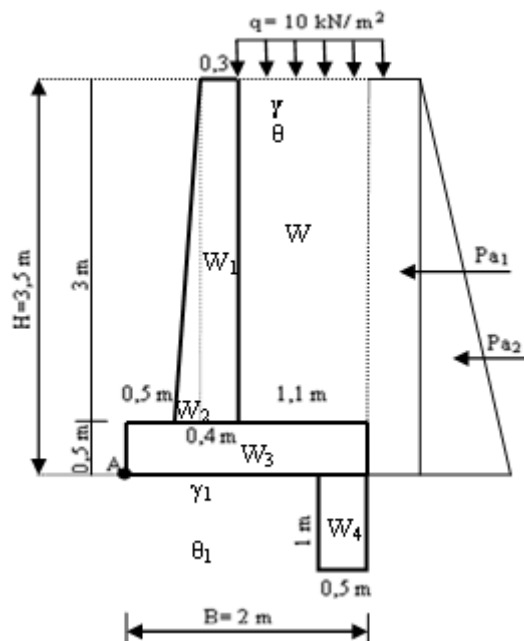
Cantilever type retaining wall profile (Project Implementation 2021)
